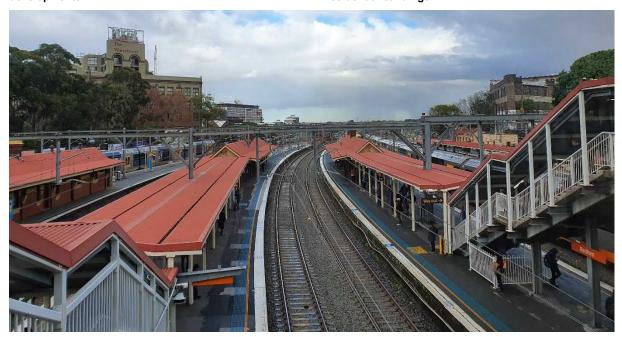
View from the existing concourse looking towards Eveleigh Railway Workshops are impeded by the overhead wiring structures
